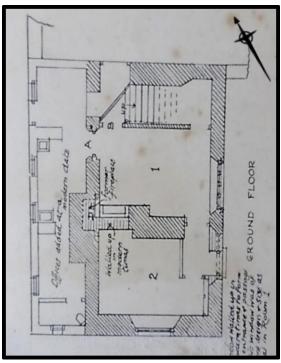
Extract from the drawing showing the ground-floor plan in 1941.
